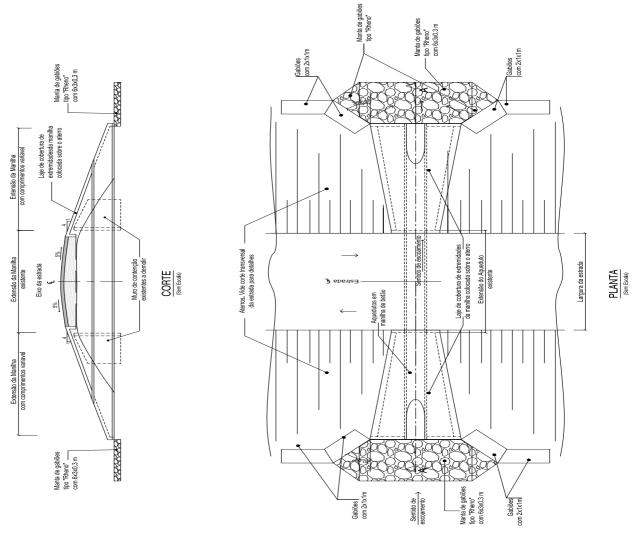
Proposed modified culvert designs (Mott MacDonald)
